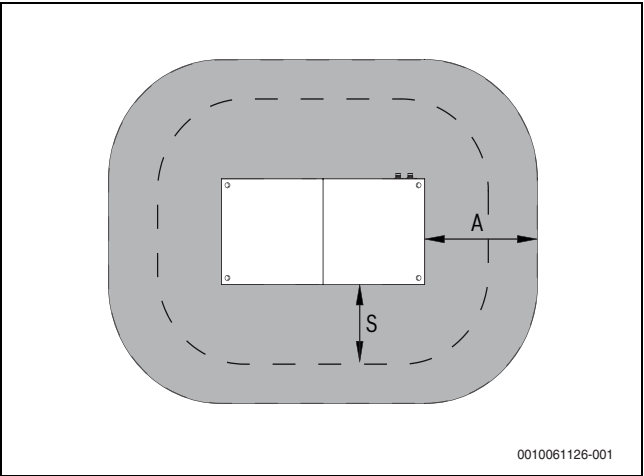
Protection zone for outdoor installation with floor-standing installation
